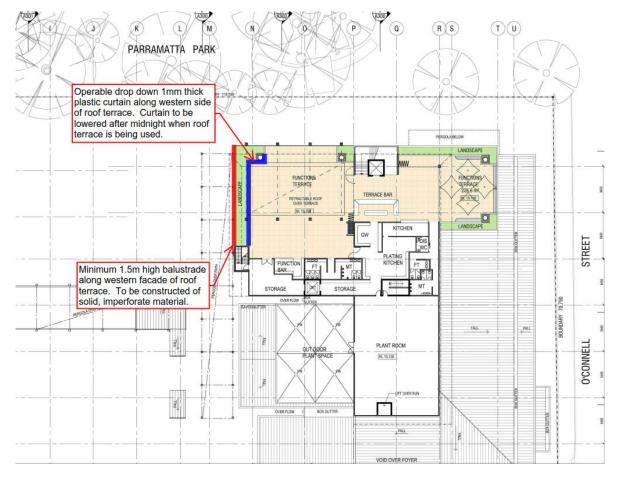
Recommended Acoustic Treatments for Roof Terrace
